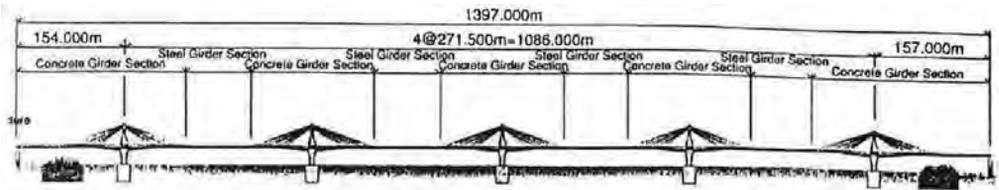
Ibigawa Bridge<sup>35</sup>
